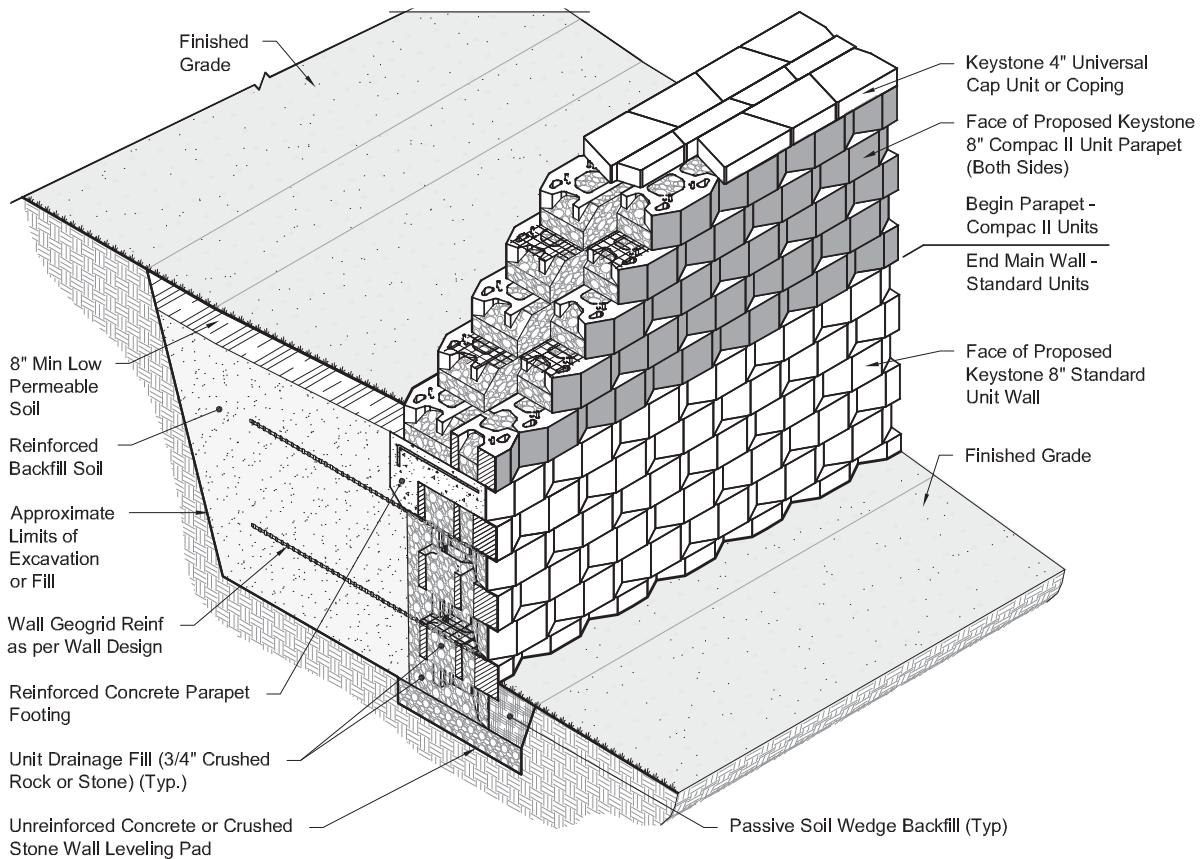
WALL/PARAPET SECTION VIEW (STANDARD & COMPAC UNITS)
